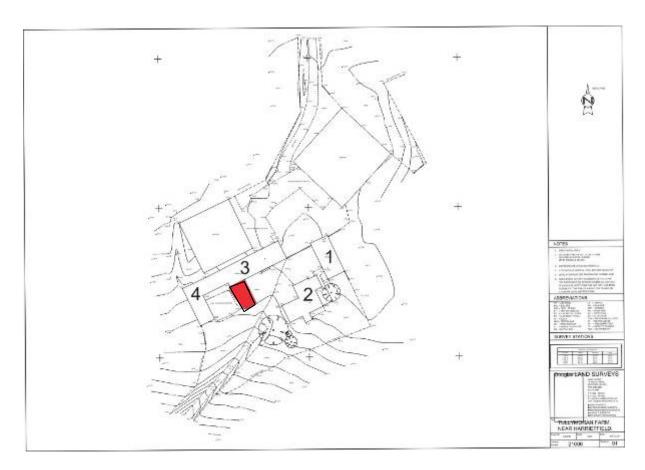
Numbered location plan of buildings surveyed (red indicates visible building platform) scale 1:1250 (based on architects survey)
